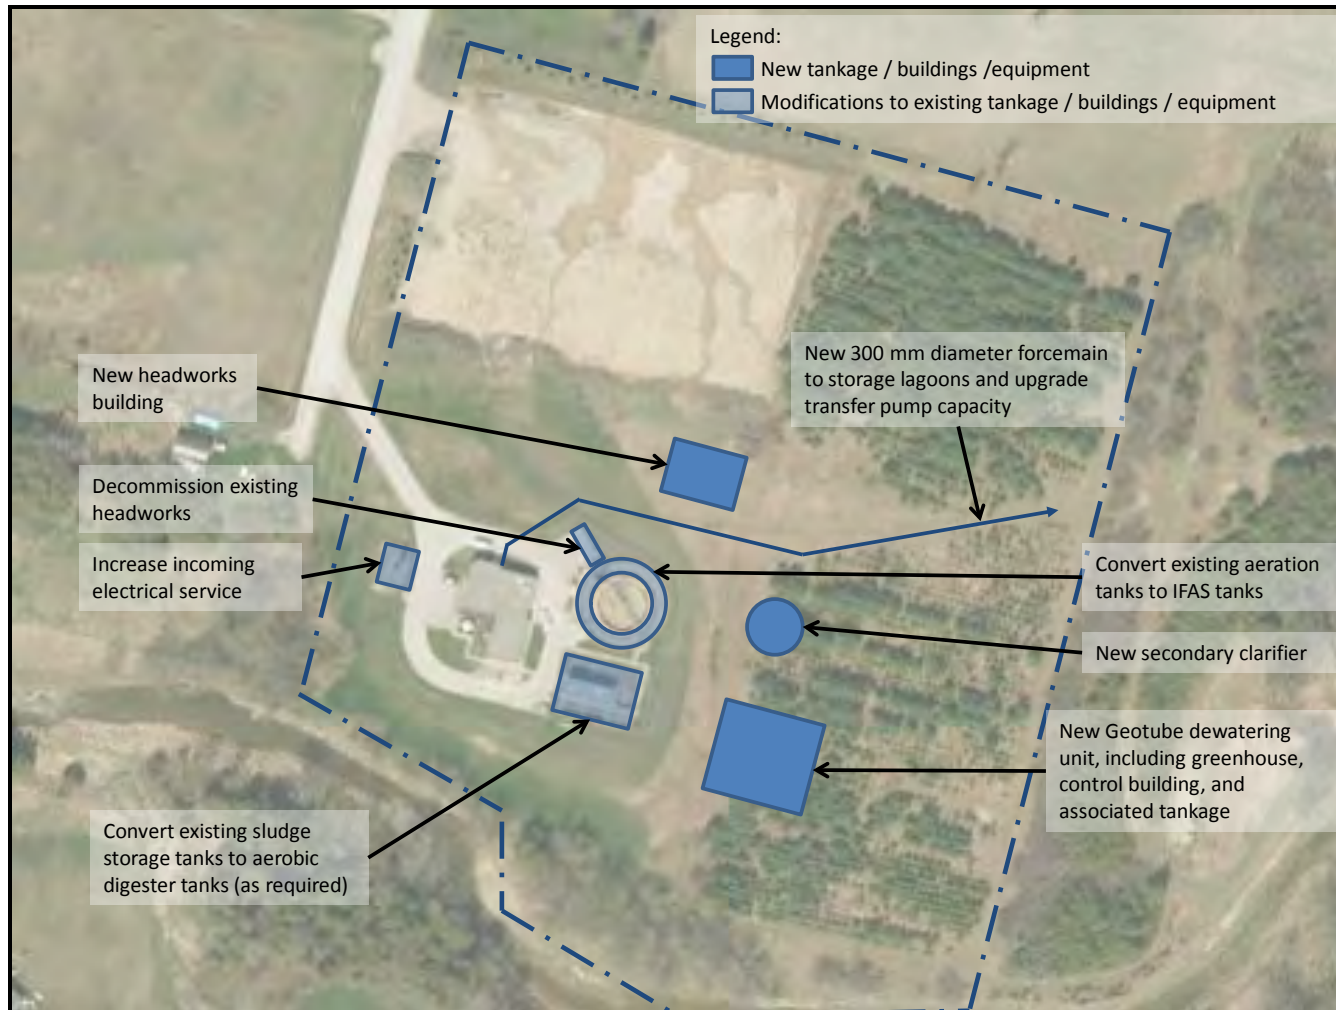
Option 3B - Retrofit Existing EA to IFAS with new Geotextile Dewatering and Cake Storage
